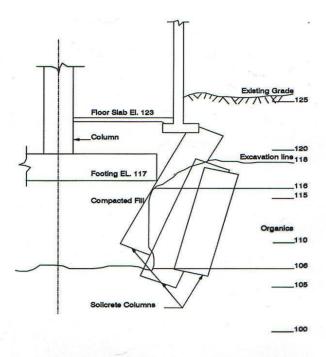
Cross Section and Soil Profile Near Footing R10 (Suncoa: Dome Stadium, Tampa, Florida).
